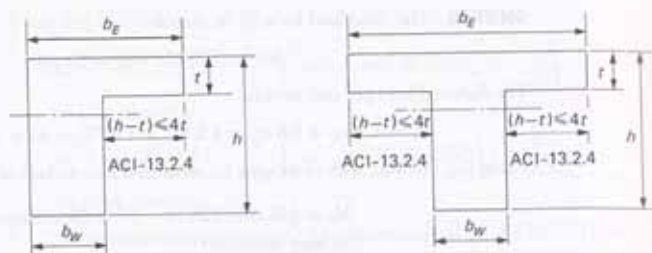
Cross-sections for moment of inertia of a flanged section.
